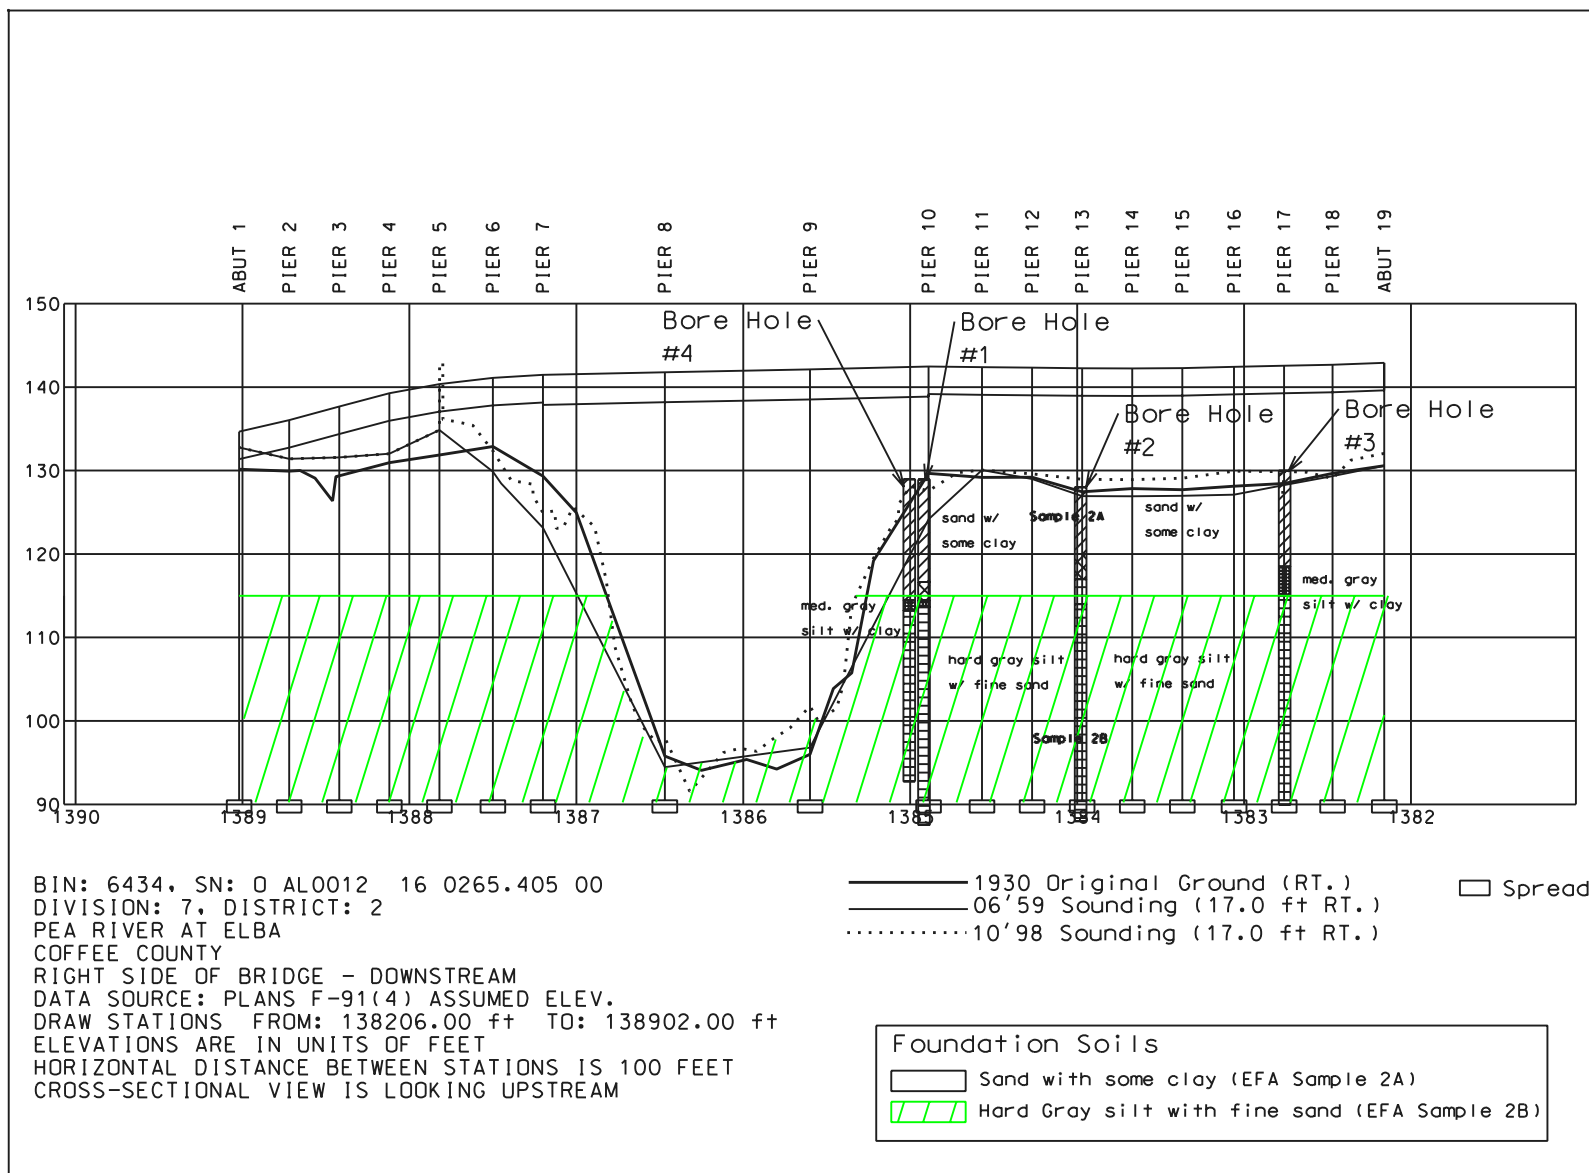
Core borings and foundation soils for the Pea River site at Elba
